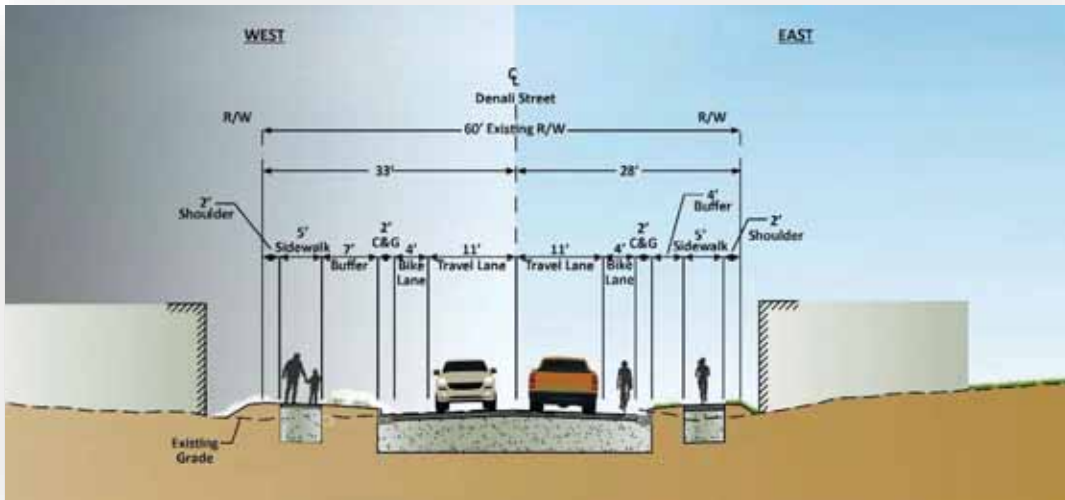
Denali Street (Northern Lights Boulevard to Fireweed Lane) – Alternative 2
